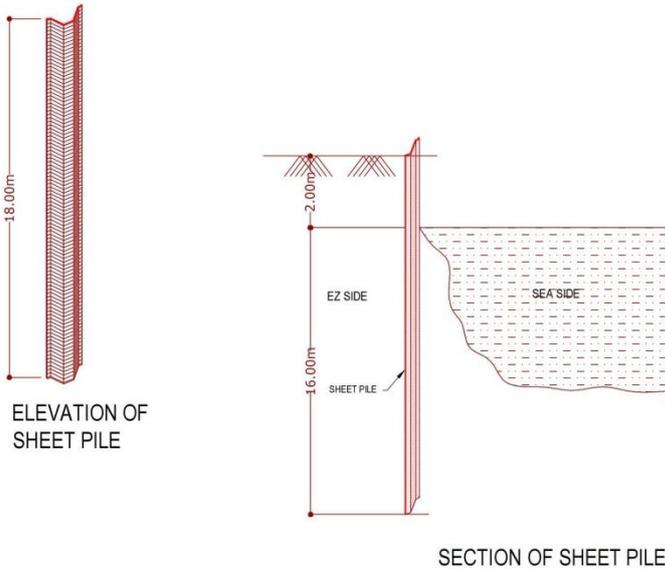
Sectional Plan of Sheet Pile
